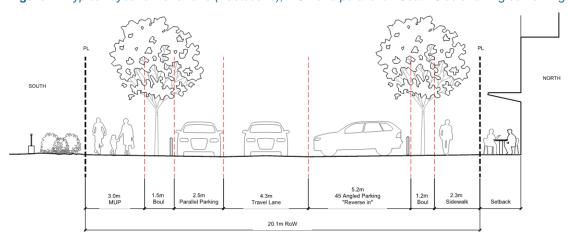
Typical section with One-way Travel Lane (Eastbound), MUP, Parallel Parking and Angled Parking on North Side
